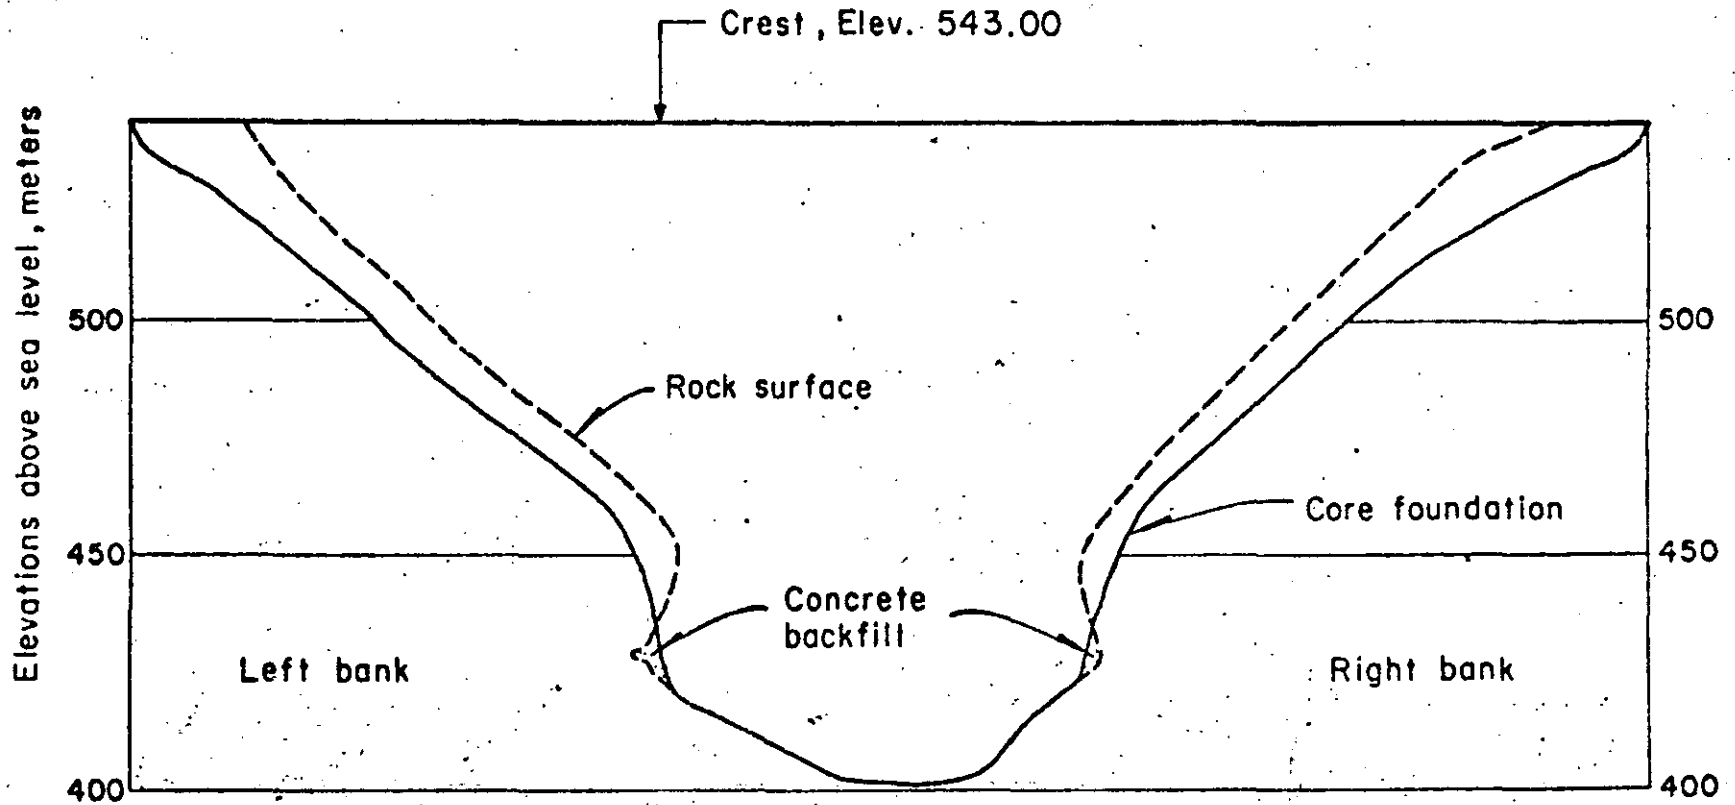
Cross-section of La Angostura Canyon and profile of core foundation
